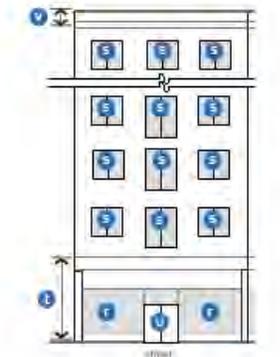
(3). Storefront Building: Street Facade Requirements.
